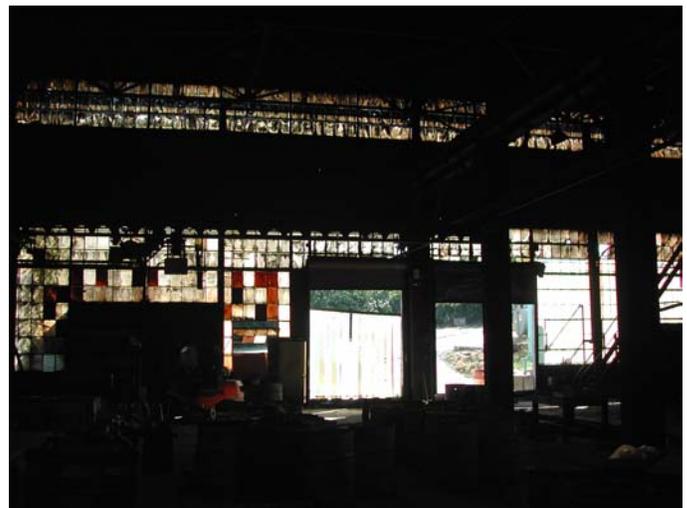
South windows with a mix of semi-transparent glass, dark glass and corrugated fiberglass. The bright window to the right of the open doors is covered with corrugated fiberglass.
